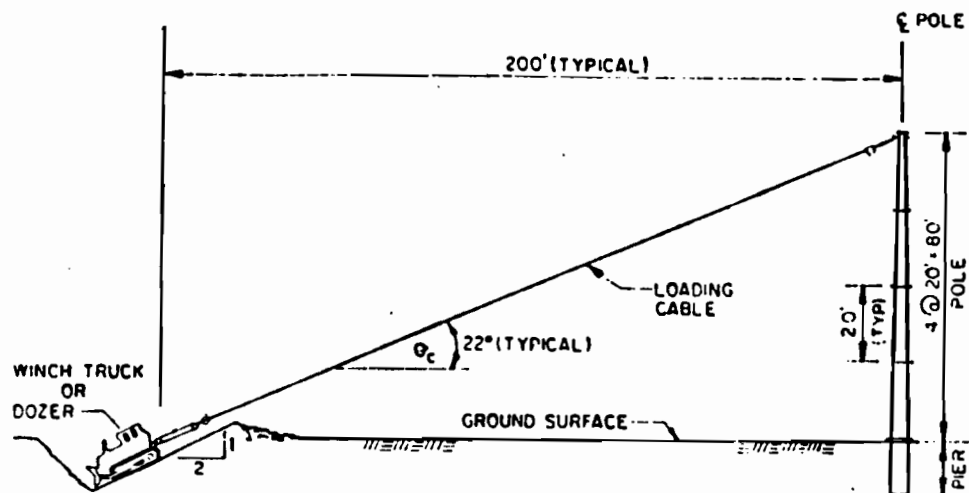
Typical Loading Configuration Used in Load Tests
